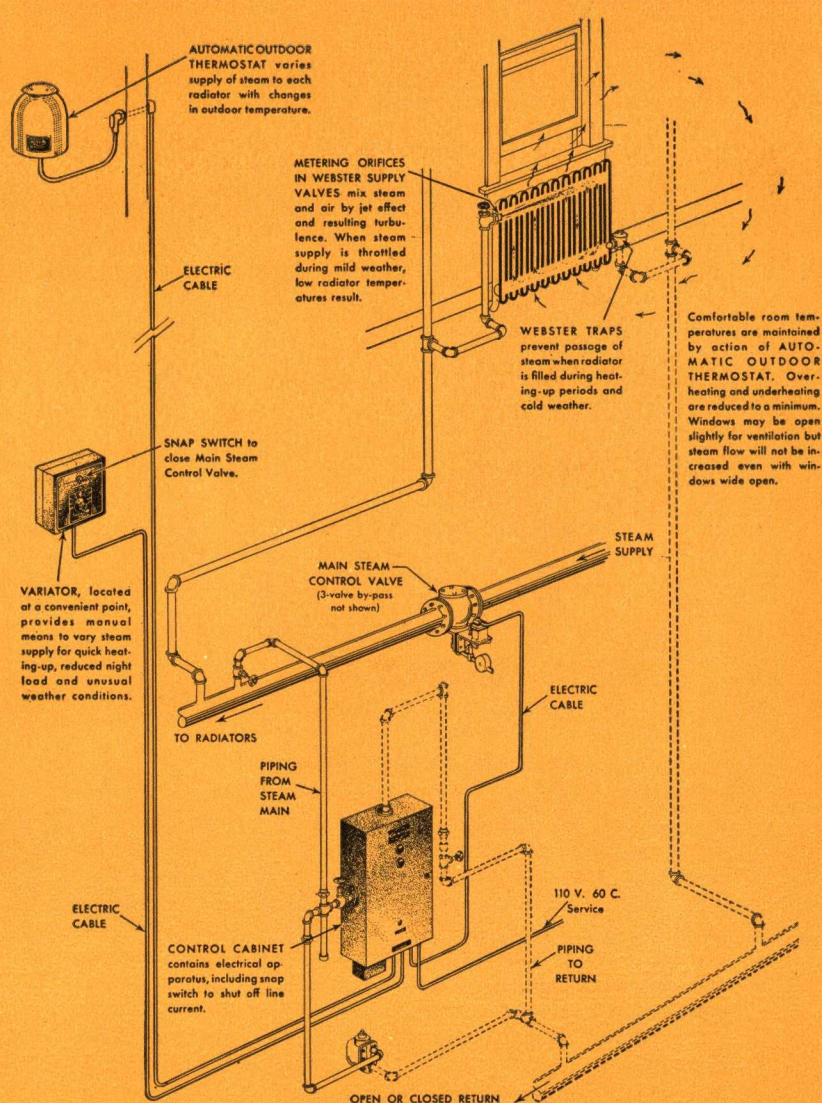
Standard Arrangement of Improved Webster System with Webster Type E-3 Electric Moderator Control, Using a Single Main Steam Control Valve
